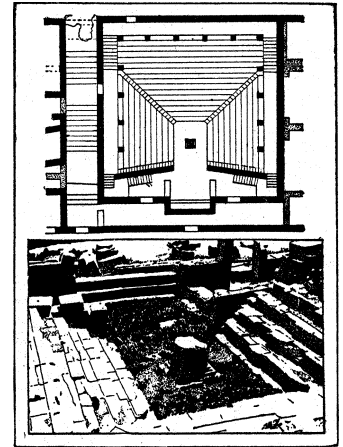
GENERAL BOULEUTERION PLAN; ABOVE, GENERAL GROUND; BELOW, PORTION OF RUINS
